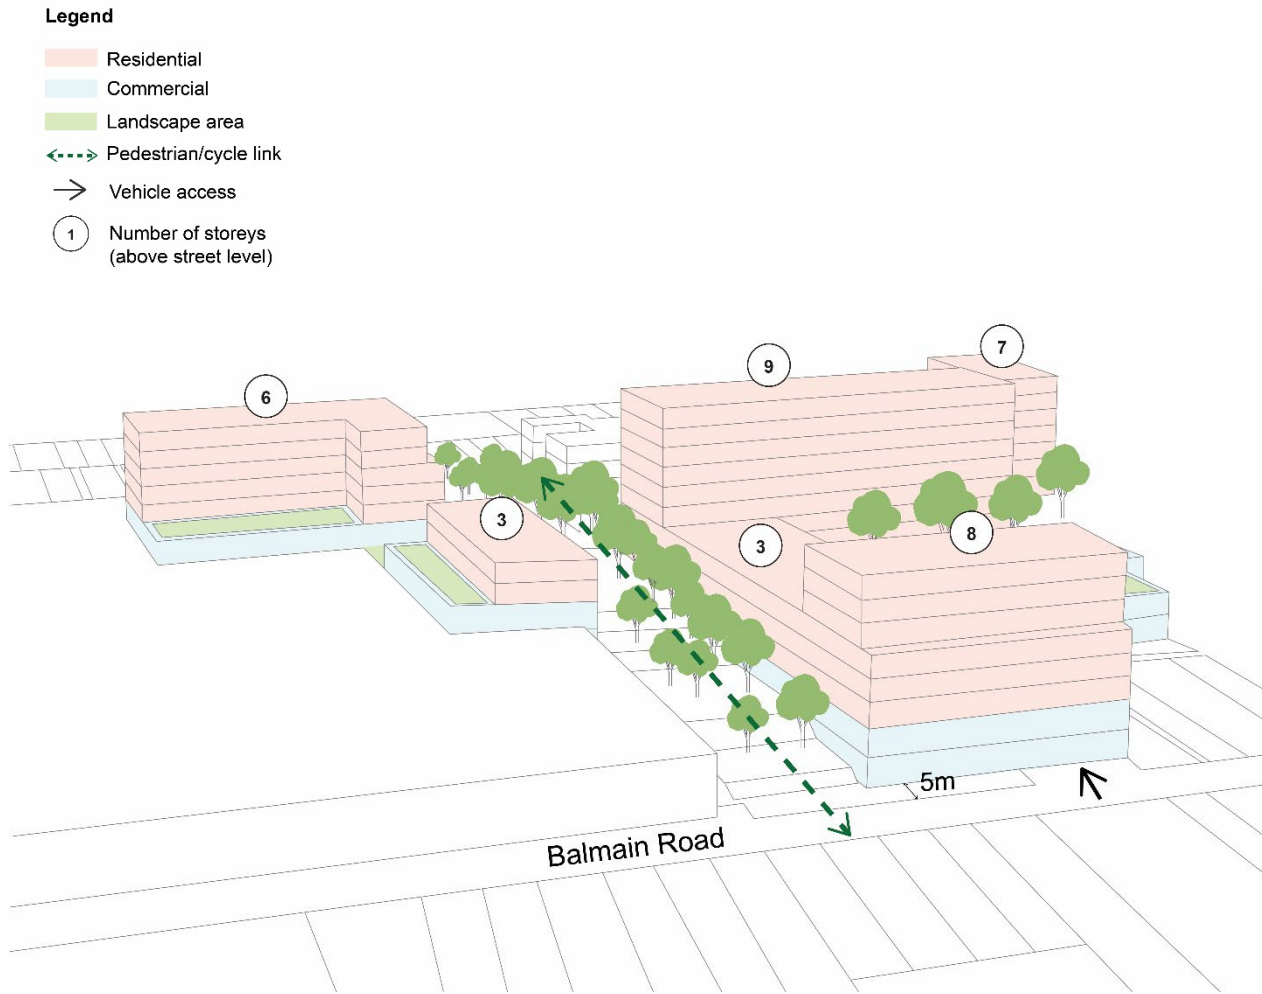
Norton Street Opportunity Site - axonometric view from Balmain Road and McDonald Street
